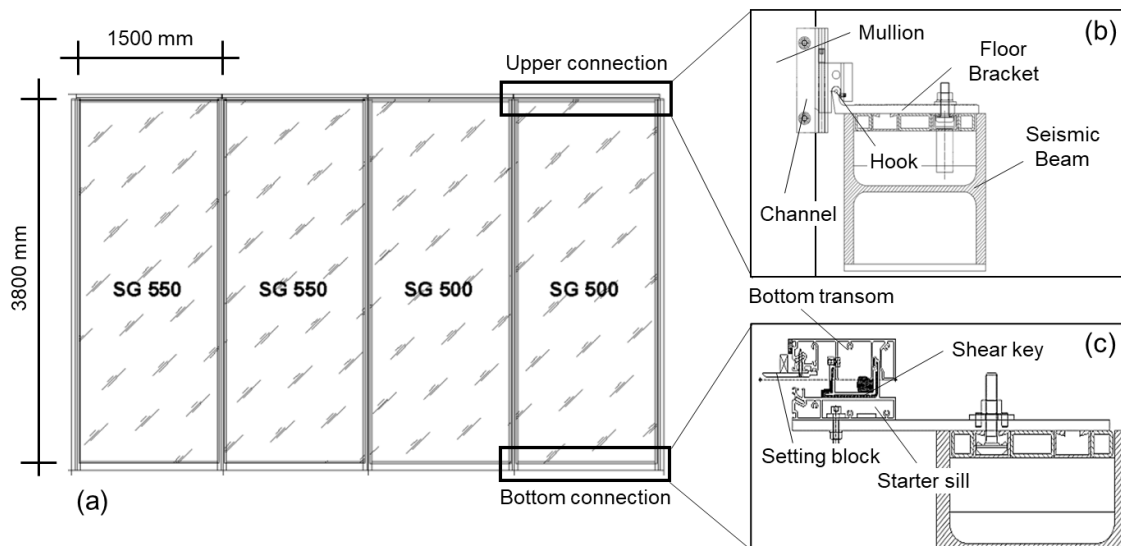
Experimental setup and connections: (a) façade mock-up tested at the laboratory of Permasteelisa Group; construction details for the upper (b) and bottom (c) connection systems (modified after Galli 2011).
